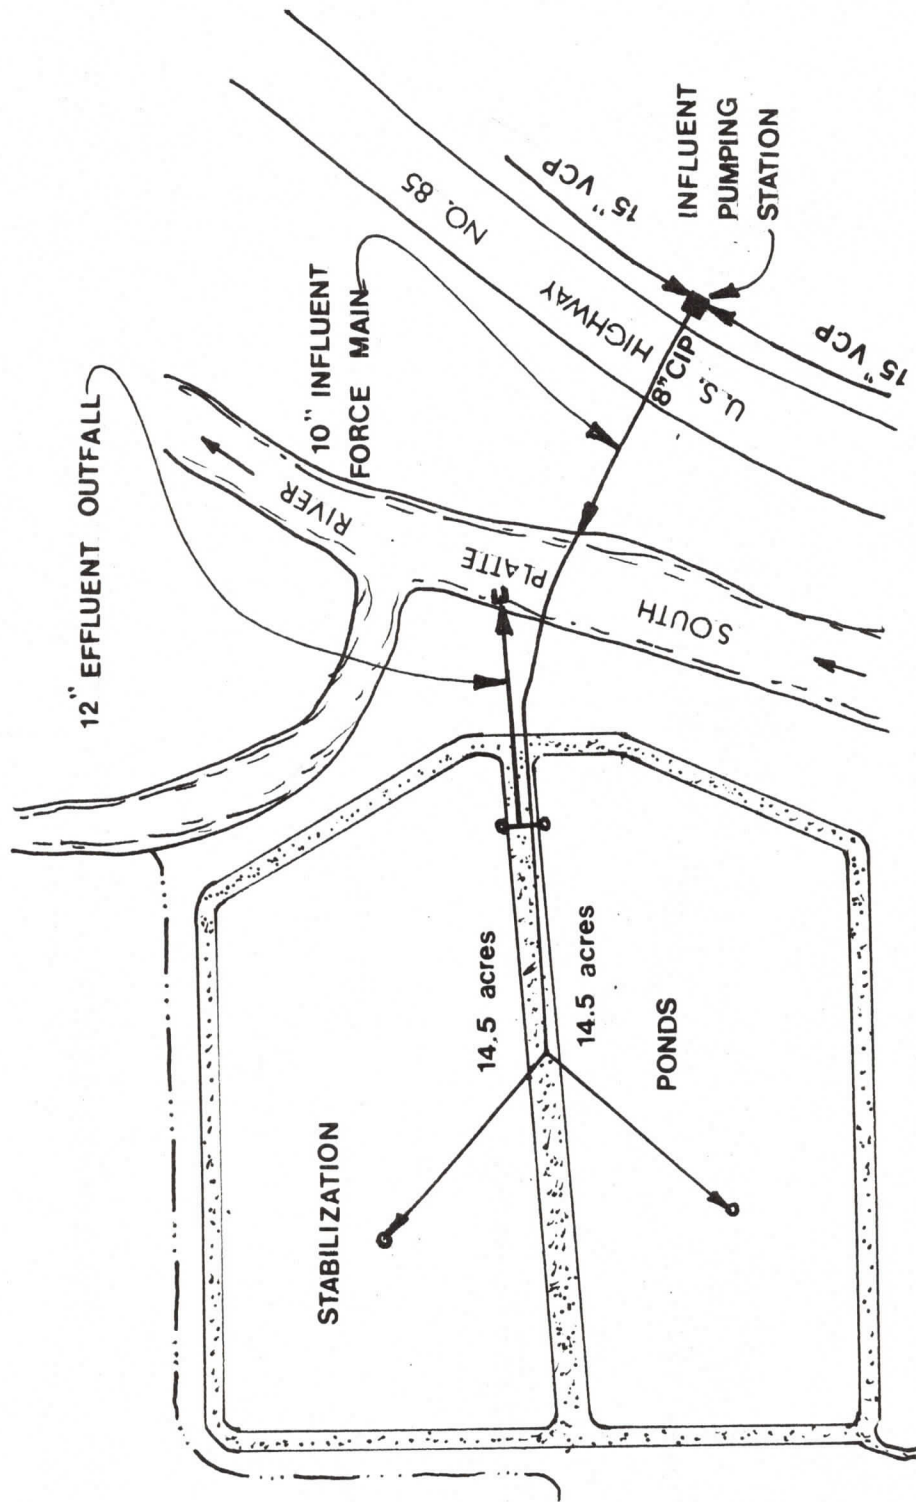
A - EXISTING WASTEWATER TREATMENT PLANT -
